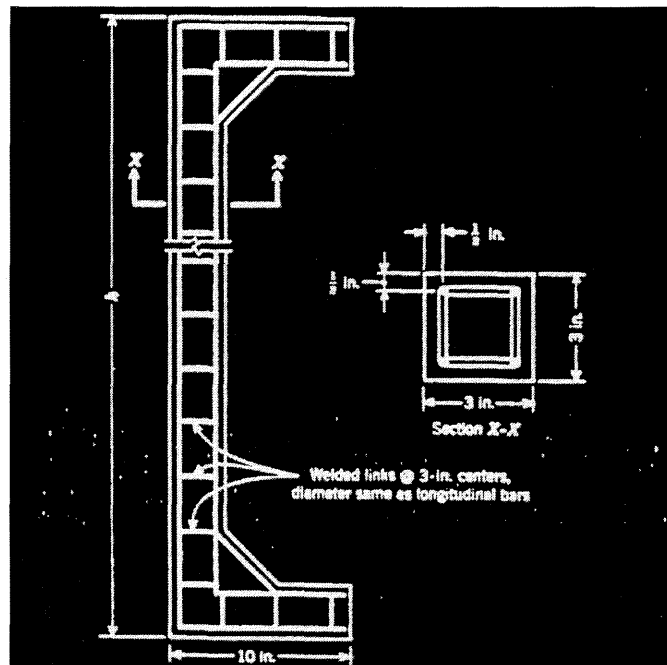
Reinforcement Details of Goyal et al. (1971)
